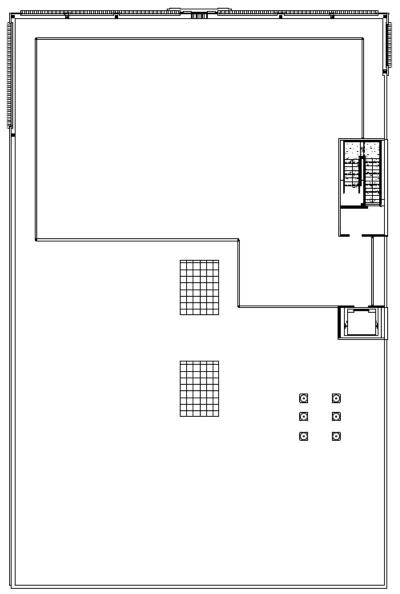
Existing Roof Plan. Courtesy of Open Studio Architecture. N
